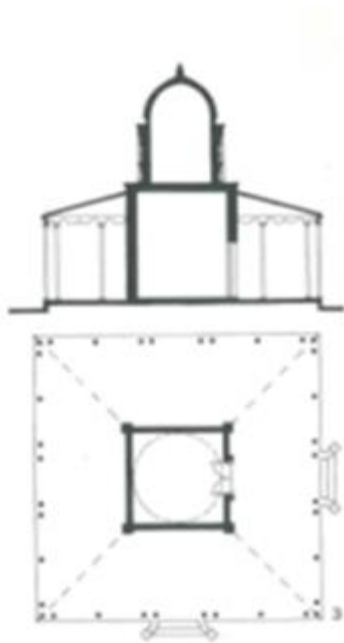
Plan and section of the earliest Raam Mandir at the VTD, built 1903-1910.
